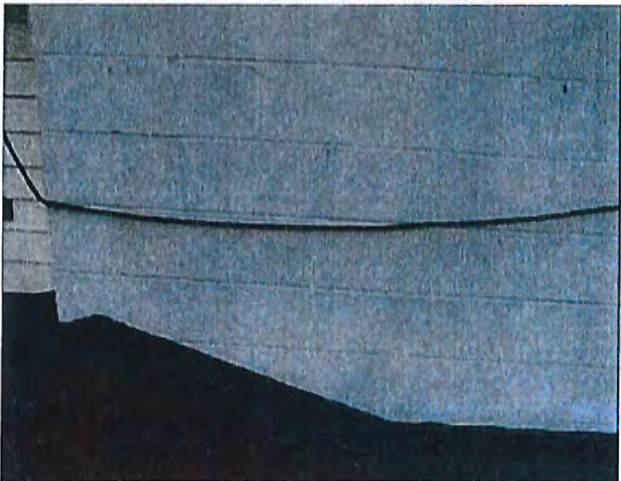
Existing Roof Gable end wall and interface to masonry block
